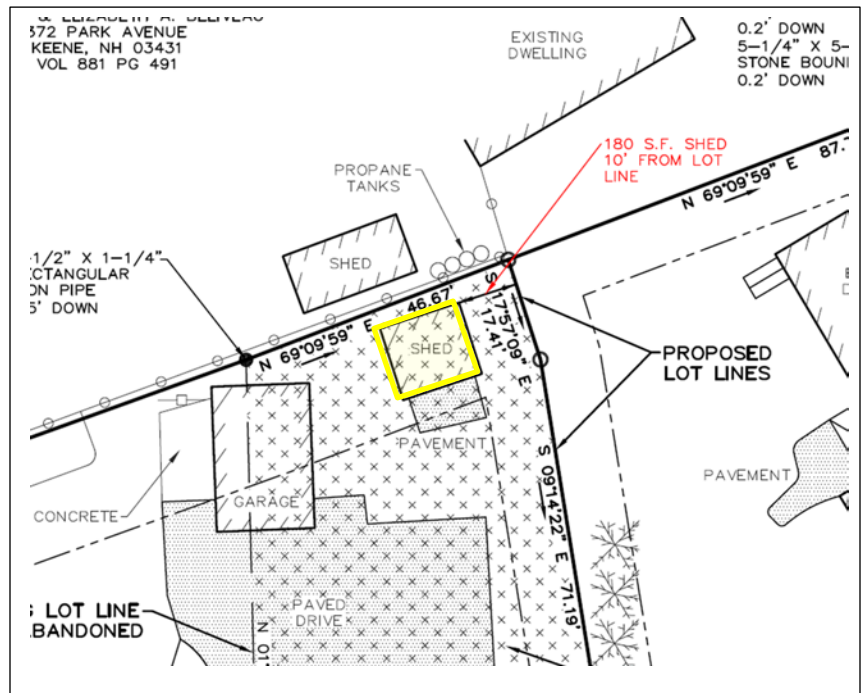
Detail of Existing Shed at Proposed, New Property Line
